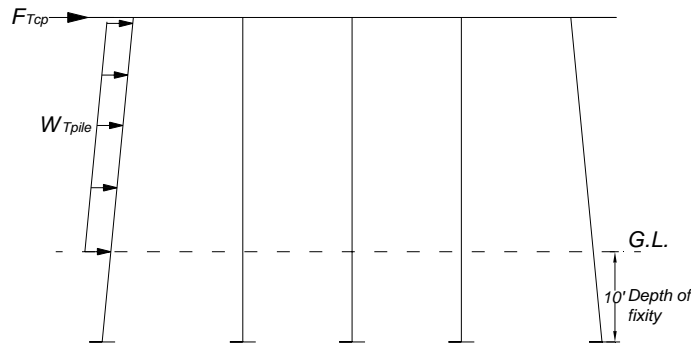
Pile Cap- Pile model generated in STAAD Pro 2004 with the transverse wind load on substructure.
